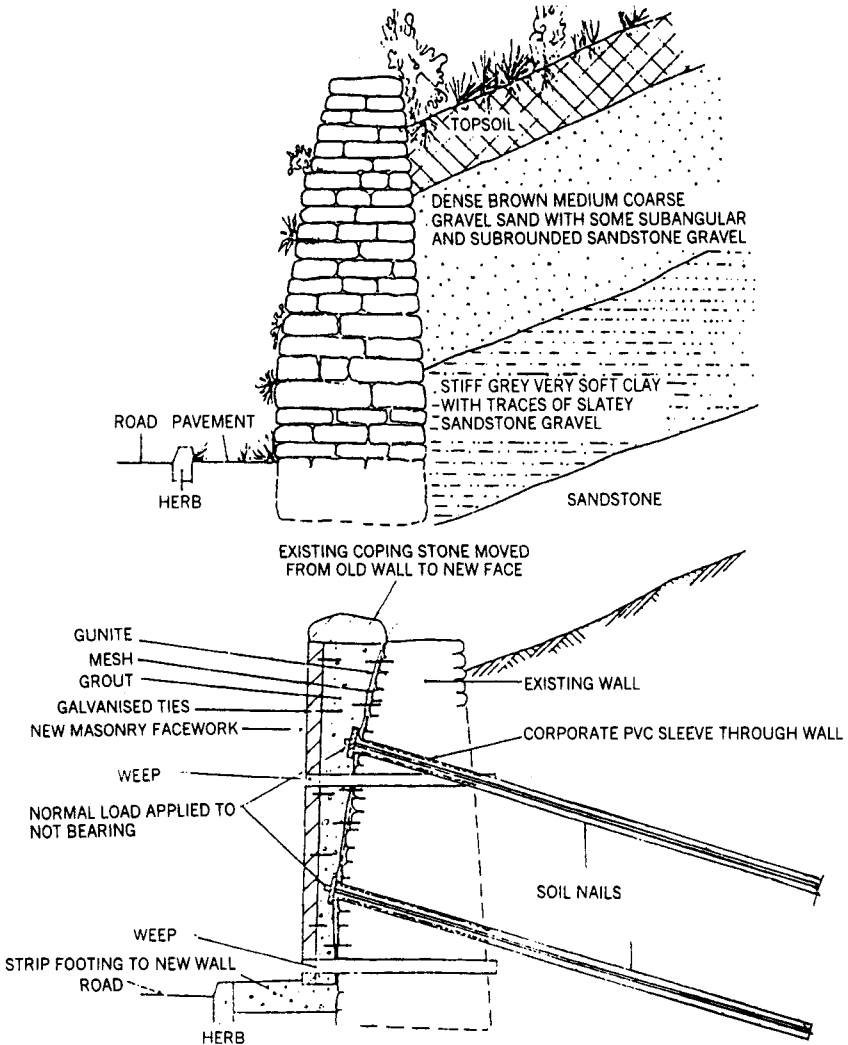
Repair of a tieback wall with soil nails. (From Bruce and Jewell, 1986.)
